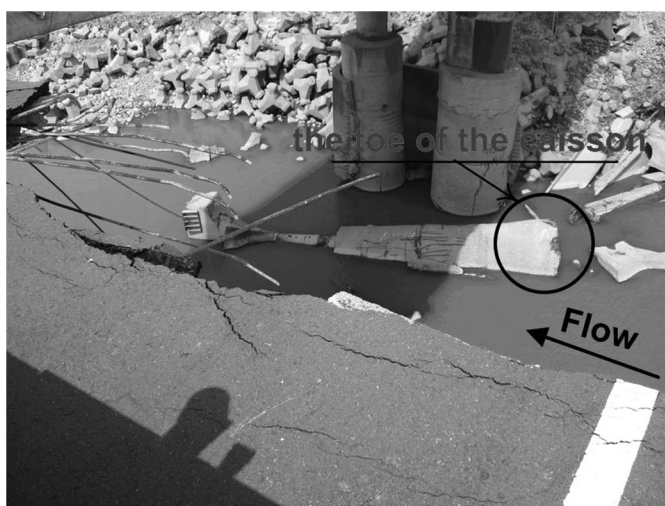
Remnant of Pier 2 after the failure of Houfeng Bridge (Oct. 2008) (image by the authors)
